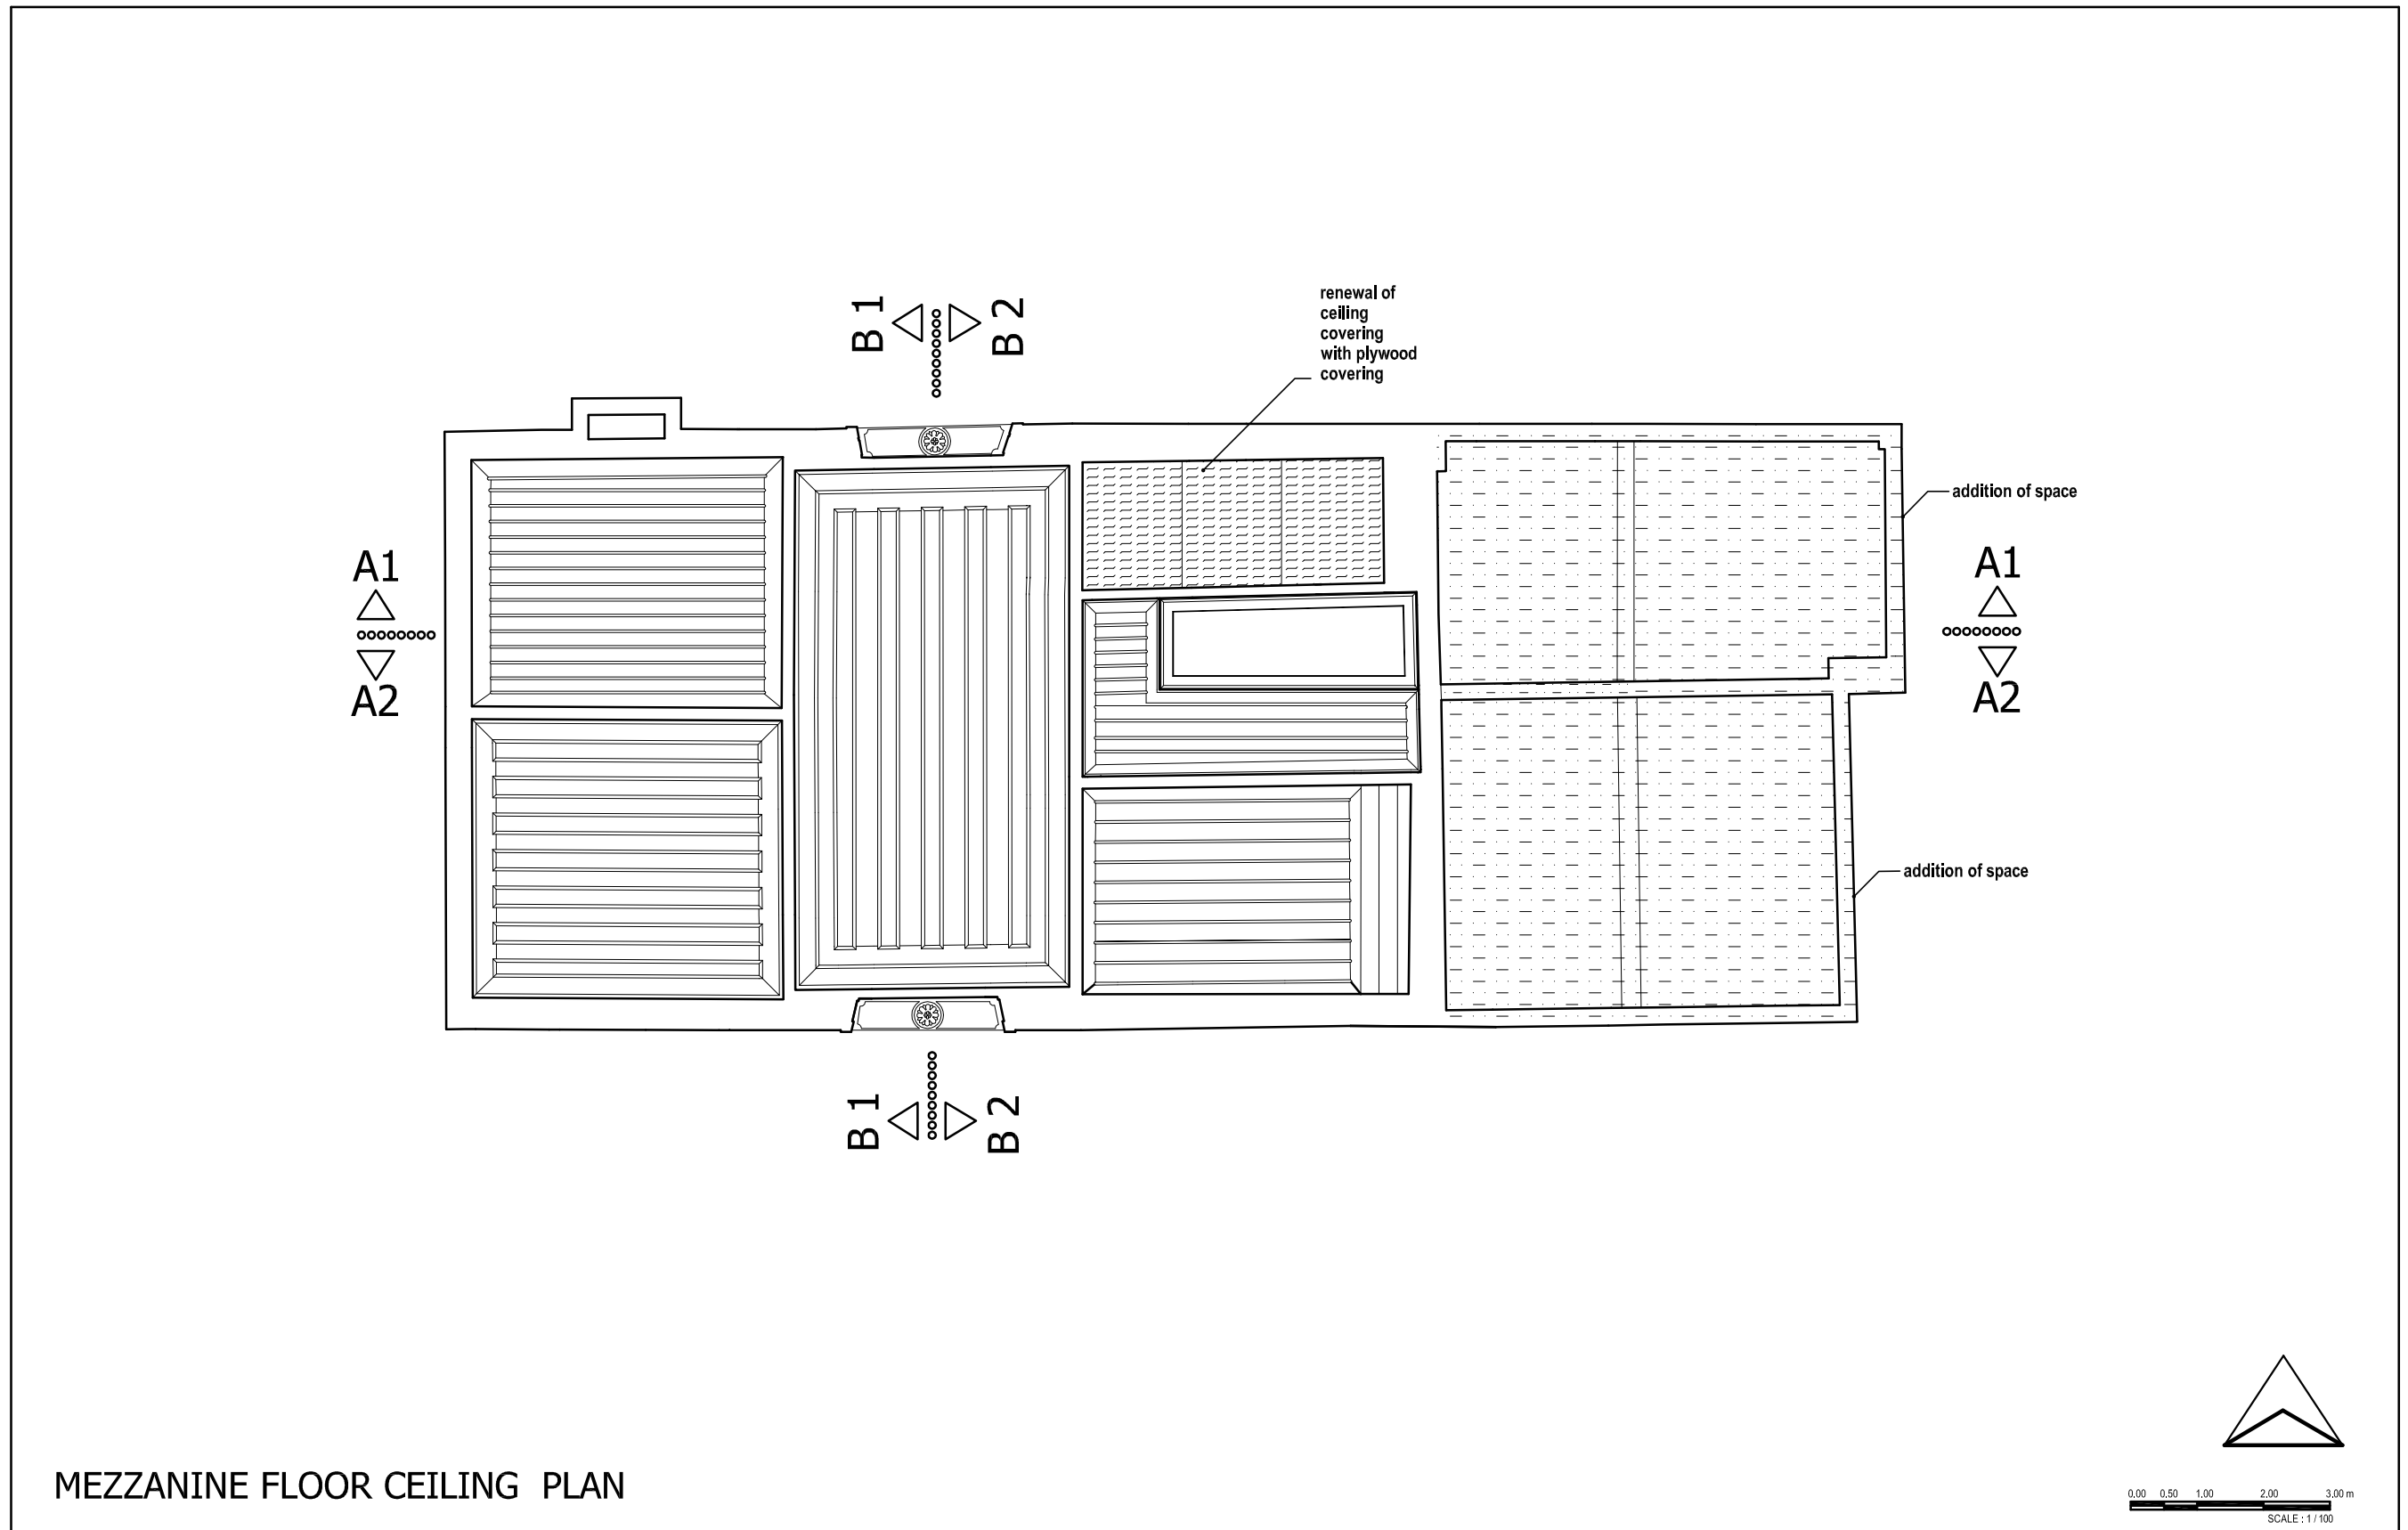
Analysis of Alterations- Mezzanine Floor Plan
